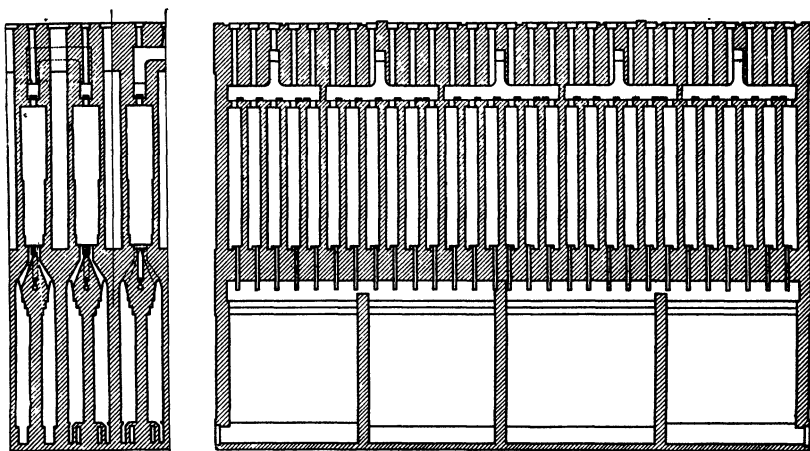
CROSS-SECTION AND LONGITUDINAL SECTION; NEW TYPE OVENS.
